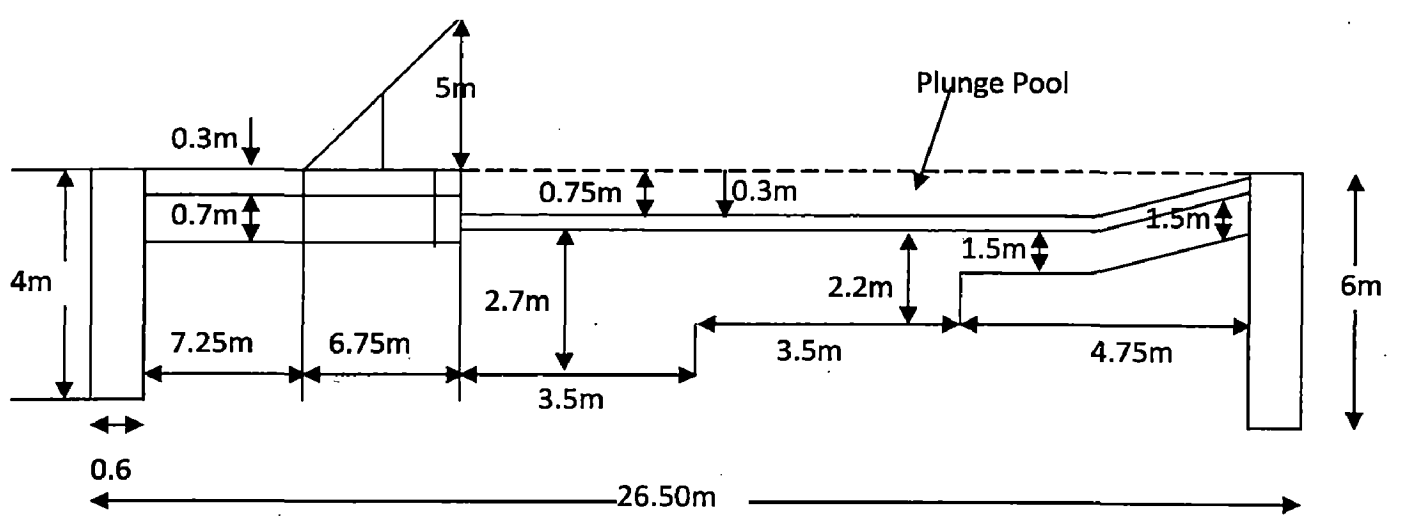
L-Section showing Plunge Pool of Piano Key Weir
